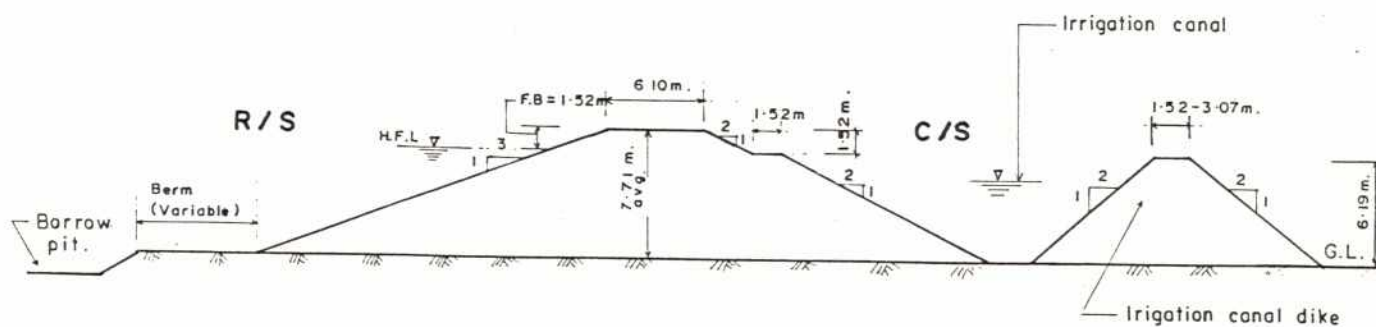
EMBANKMENT SECTION WITH IRRIGATION CANAL
